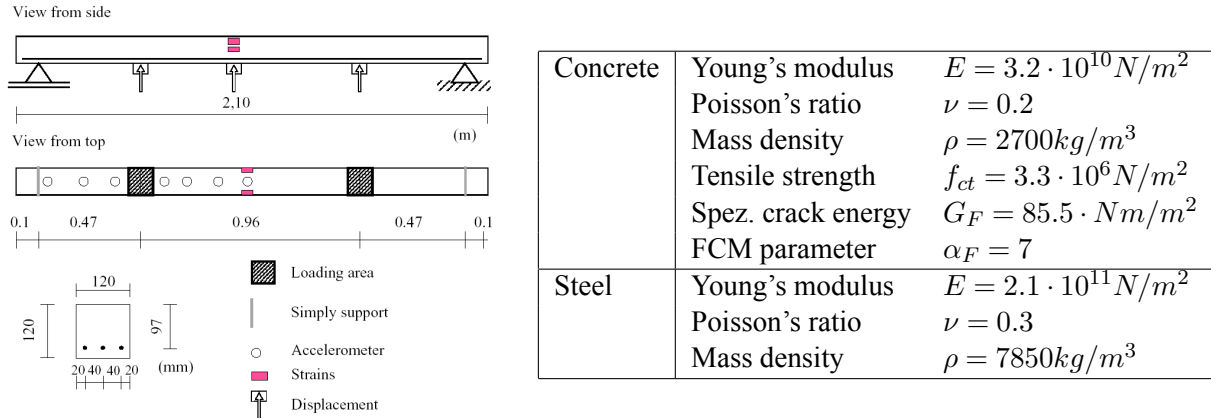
Simple supported beam tested in Ebert and Bucher 2002
